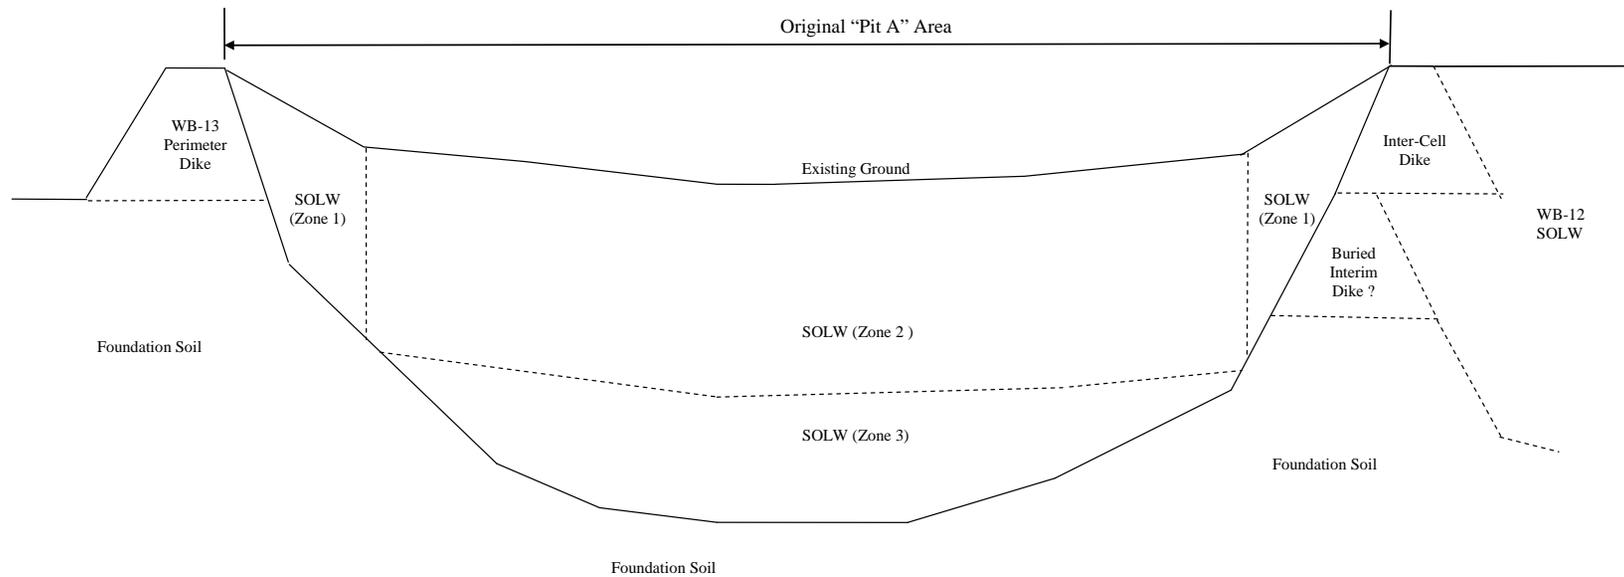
Schematic of Subsurface Profile at Cross Section D-D'
